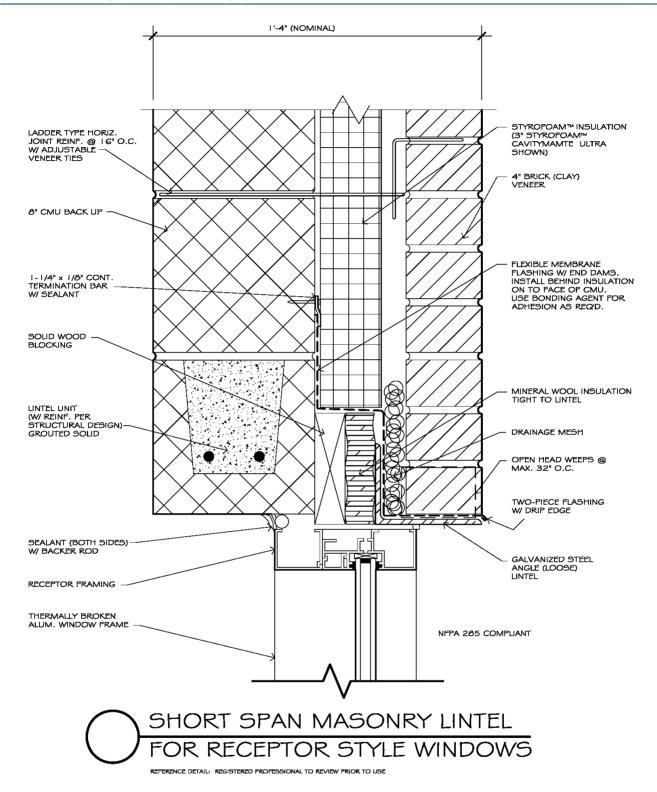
Window / Door Opening Detail w/Mineral Wool & Fire Treated Wood Blocking
